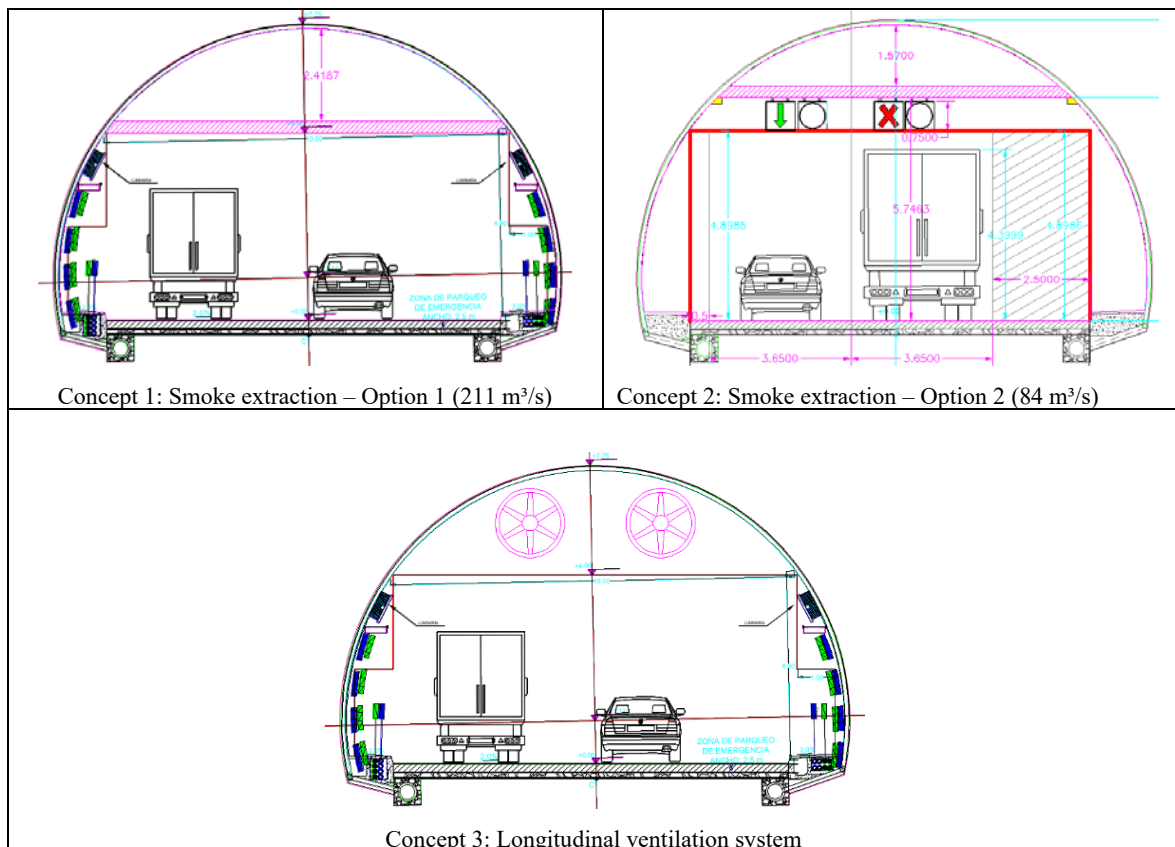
Alternative ventilation concepts feasible in existing tunnel profile
